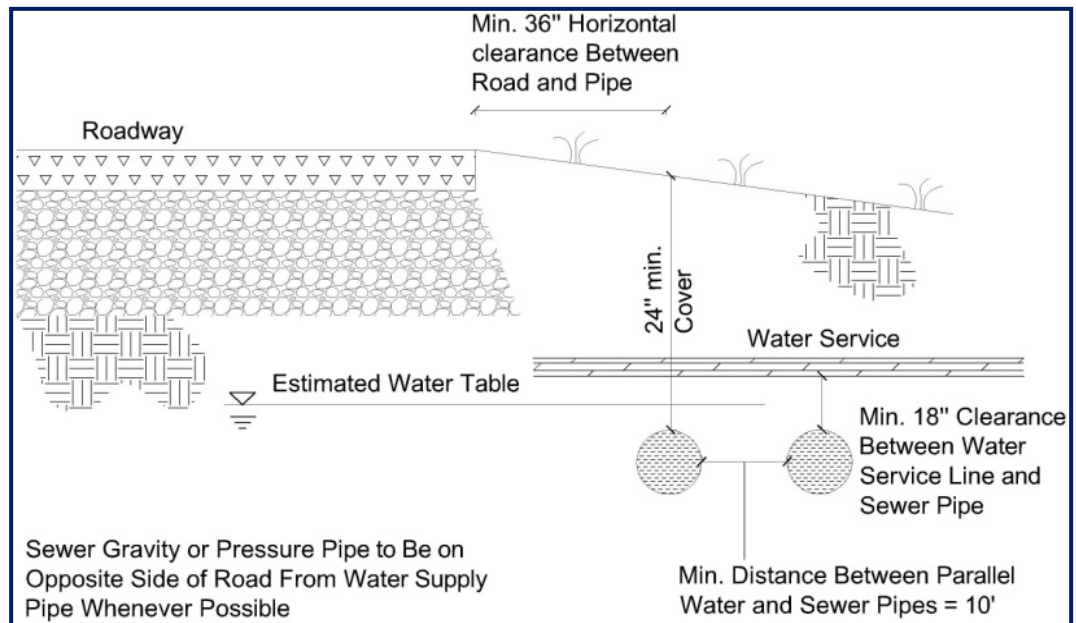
Typical Pipe Installation Cross-Section along Roadway
